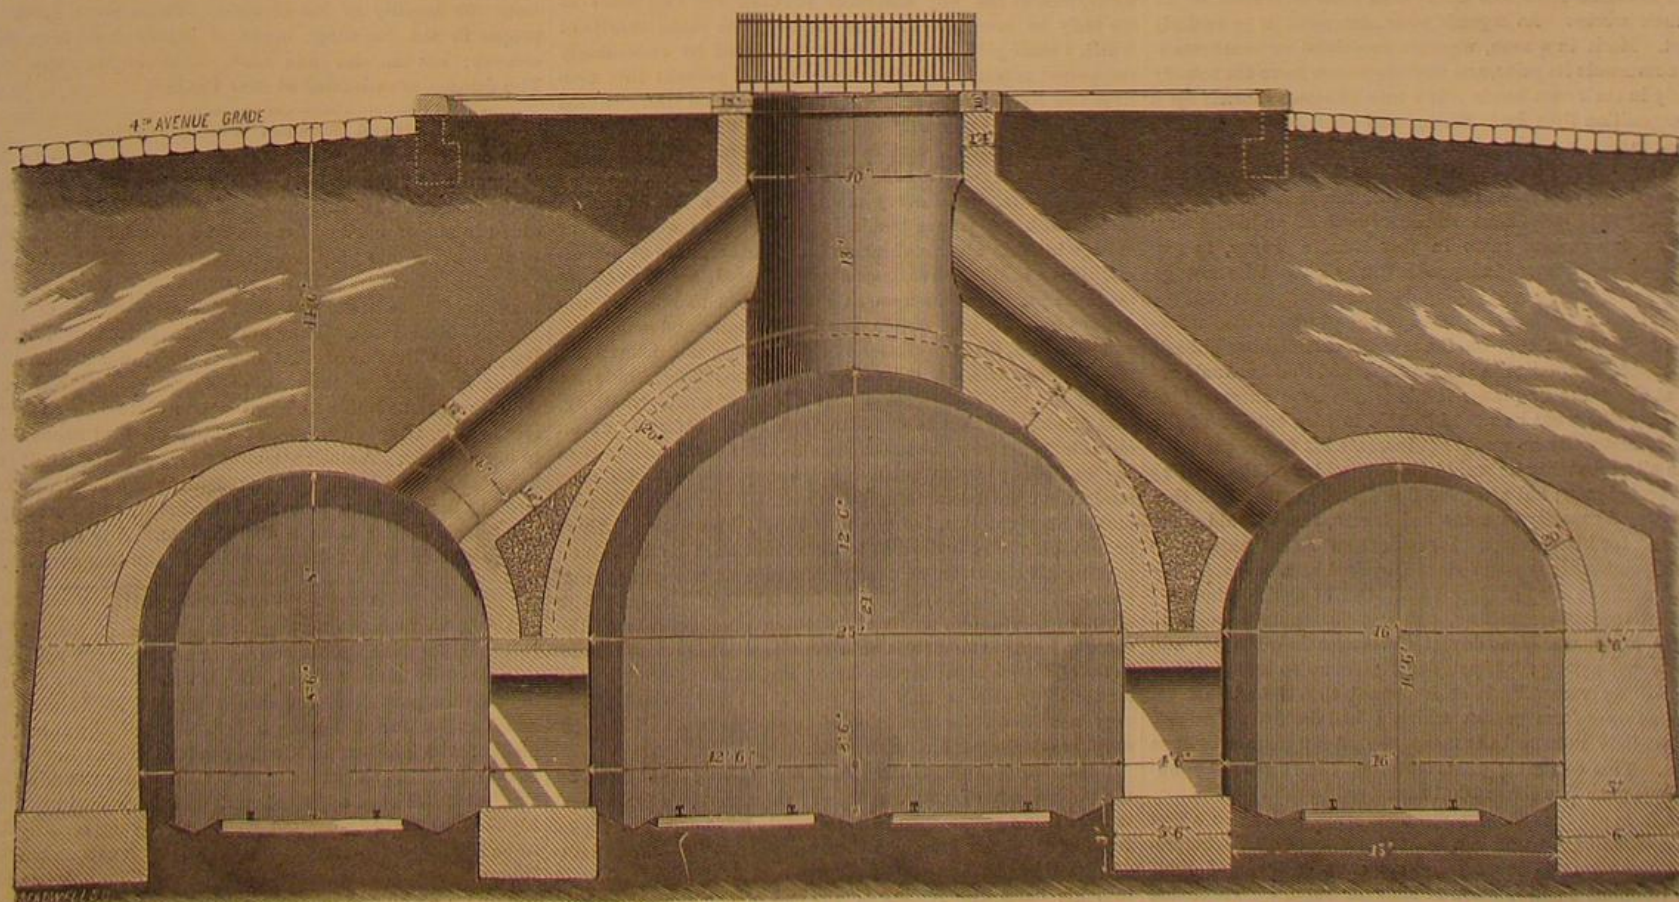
THE UNDERGROUND RAILWAY IN NEW YORK.—CROSS SECTIONS OF THE MASONRY TUNNELS AND VENTILATING SHAFTS.
